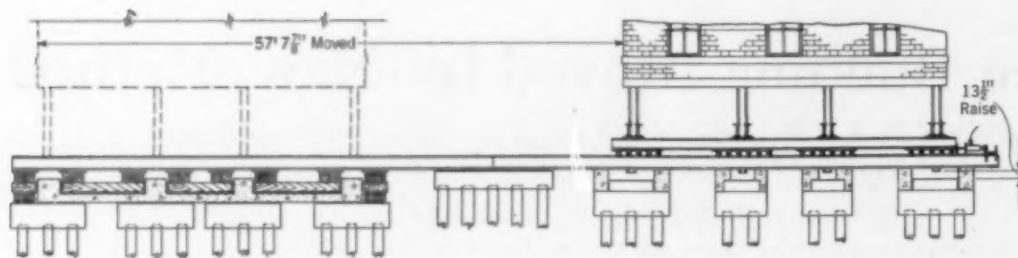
SCHEMATIC ELEVATION SHOWING METHOD OF MOVING BUILDING BY ROLLERS FROM OLD (RIGHT) TO NEW (LEFT) FOUNDATION
